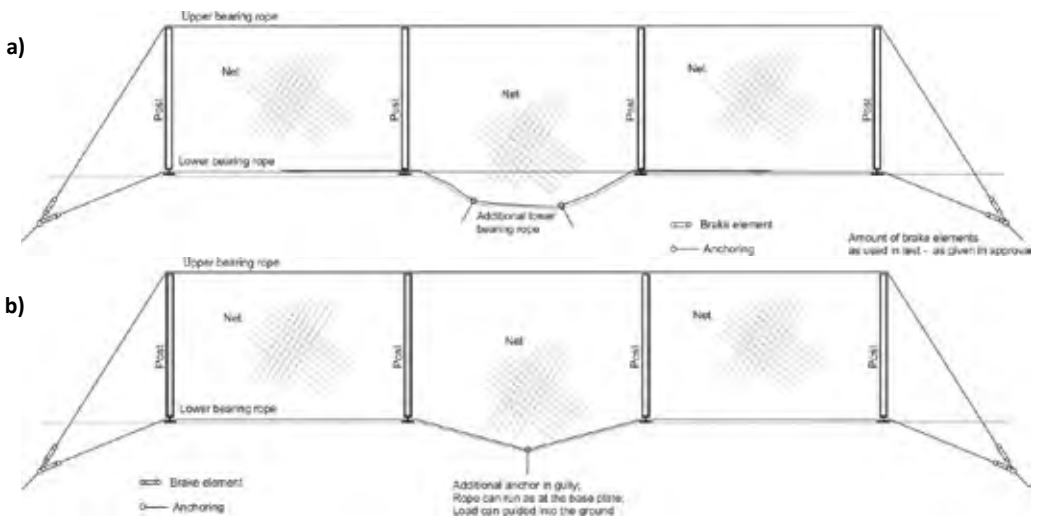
Solutions for gully nets where a) additional anchoring and an additional bearing rope are used, and b) additional anchoring with no additional bearing rope is used.
